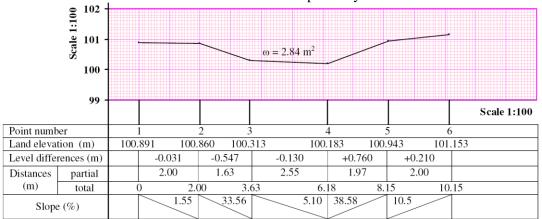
Transversal section through the CC<sub>1</sub> canal, upstream, beside the blocked culvert
